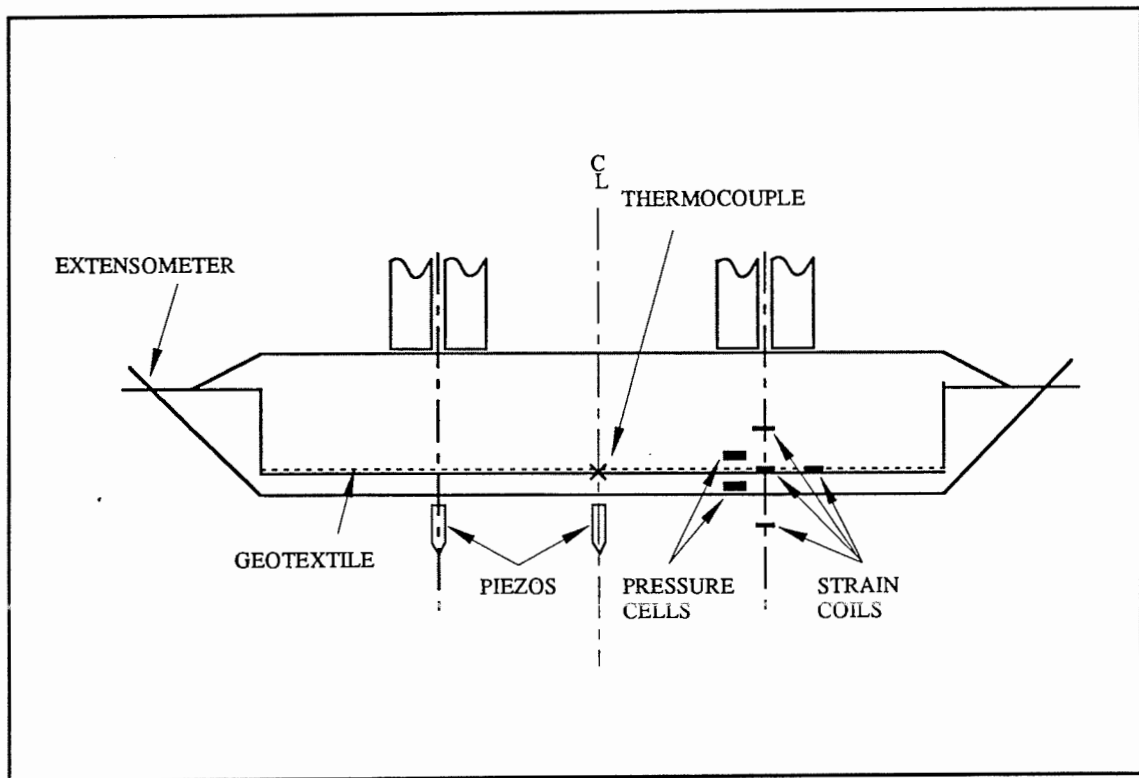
Instrumentation Layout - Upper-bound Pavements
